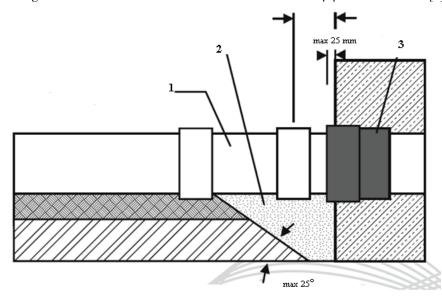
Method of connecting the pipes to the concrete $(1 - \text{short pipe section (not over 2 m or 2 x DN, not less than 1 m 2 x DN); 2 - tamped backfill SC1 or SC2 (stabilized); 3 - elastomeric tape).$
